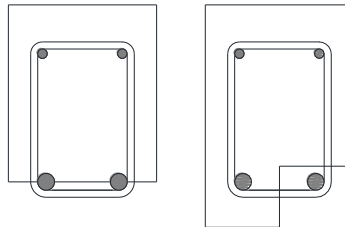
Test specimen for partial spalling evaluation.
